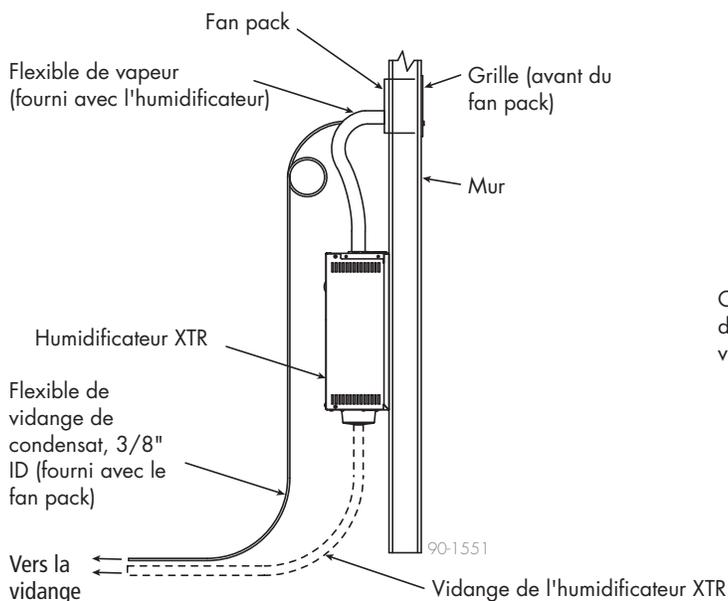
PIPING CONNECTIONS TO XTR FAN PACK
